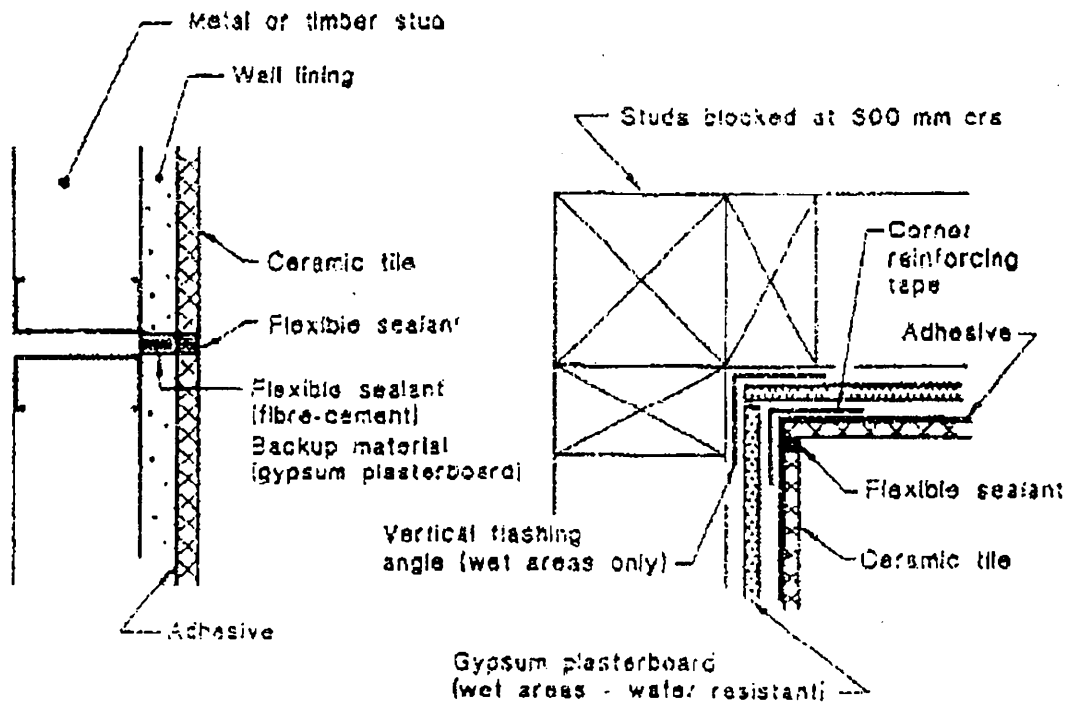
EXAMPLE OF WALL TILING SYSTEM
